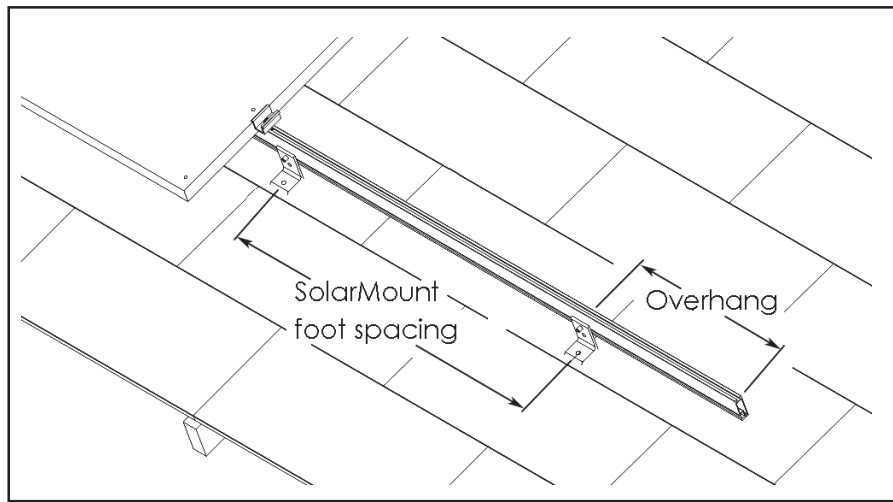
SolarMount foot spacing refers to the distance between feet on the same rail. Overhang, the distance from end of the rail to the first foot, must be no more than half the foot spacing.
